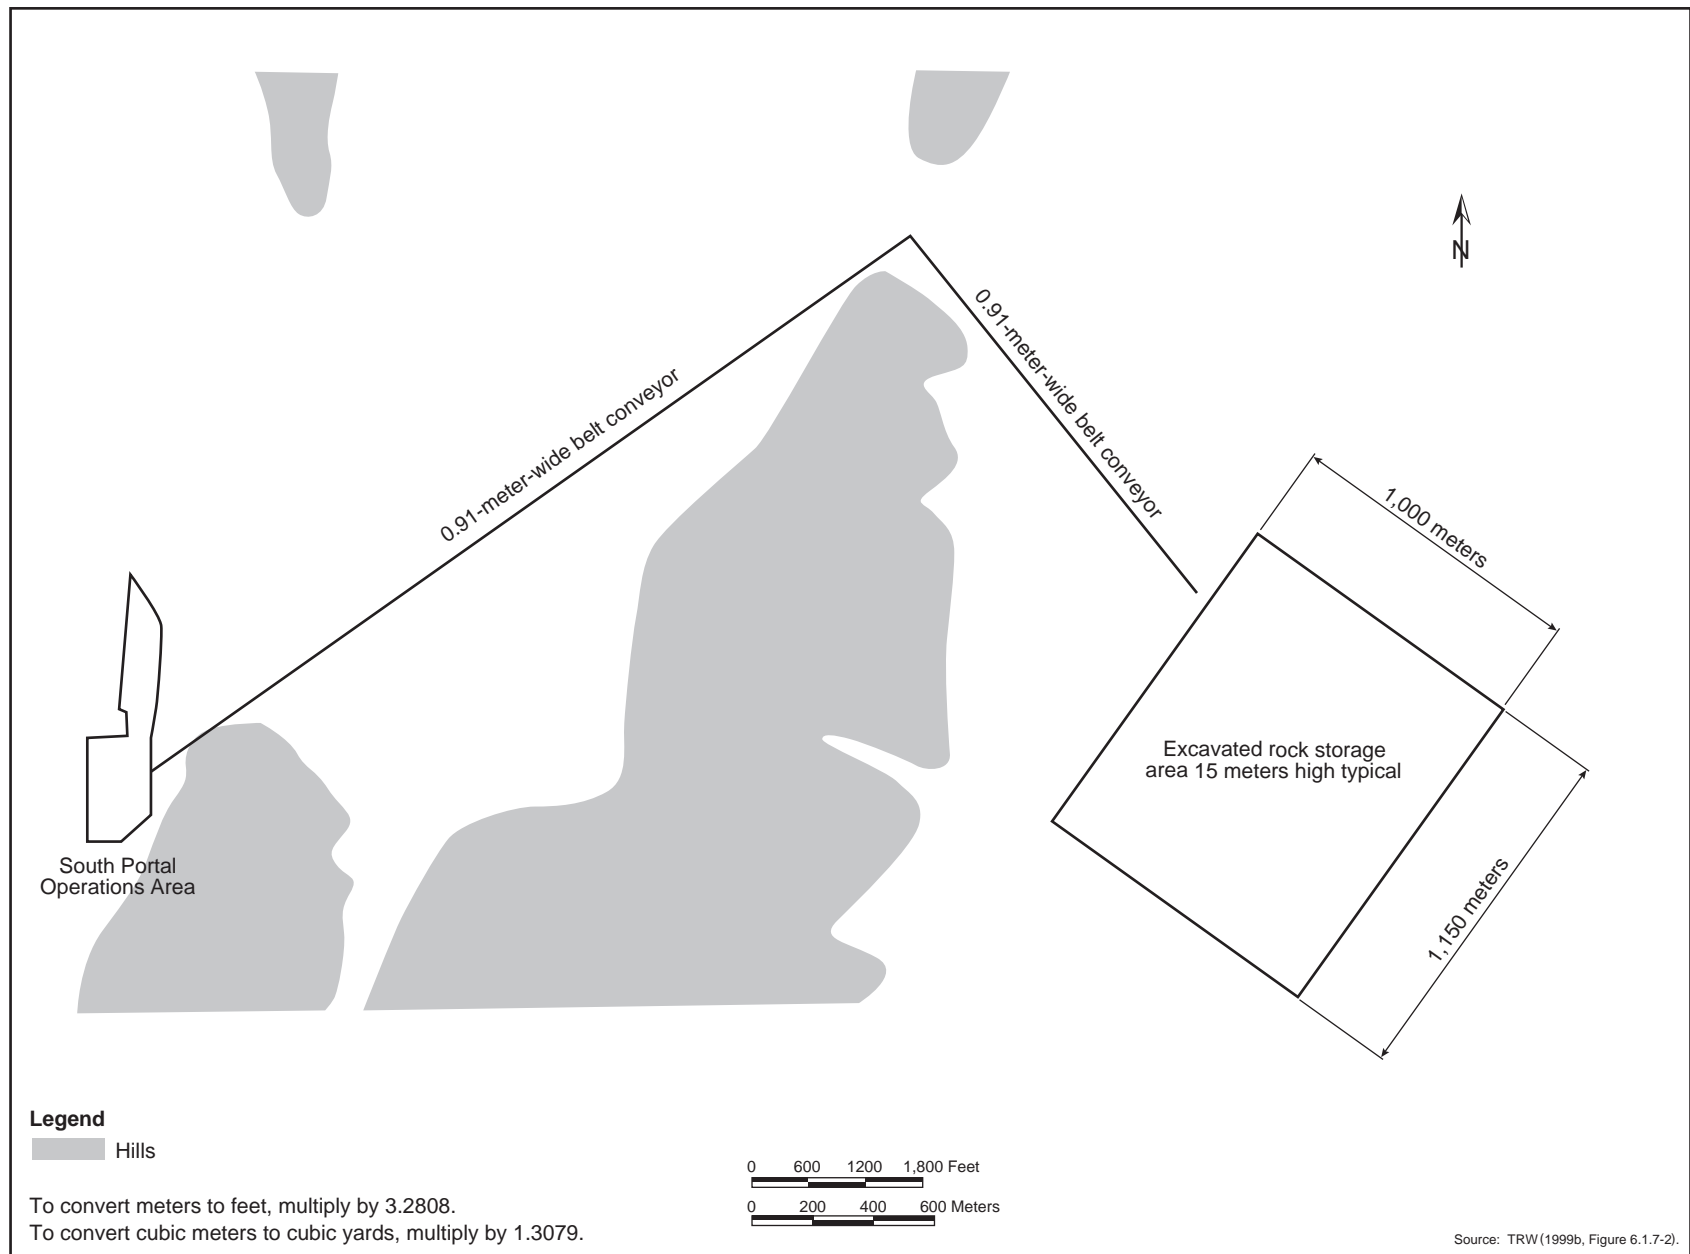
Location of excavated rock storage area for low thermal load scenario.
